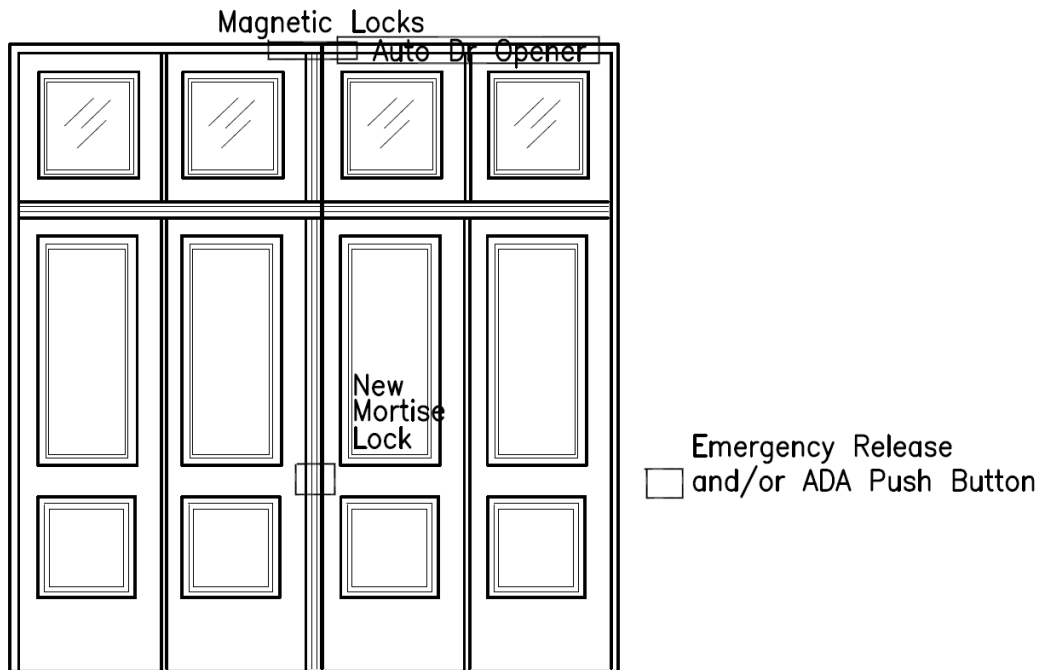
Northern door showing proposed ADA automatic door equipment.
